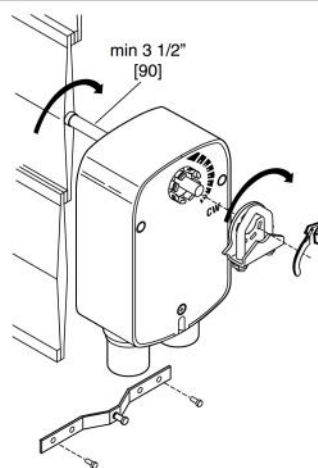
FIGURE B – Standard Mounting (Dimensions in Inches [mm])
